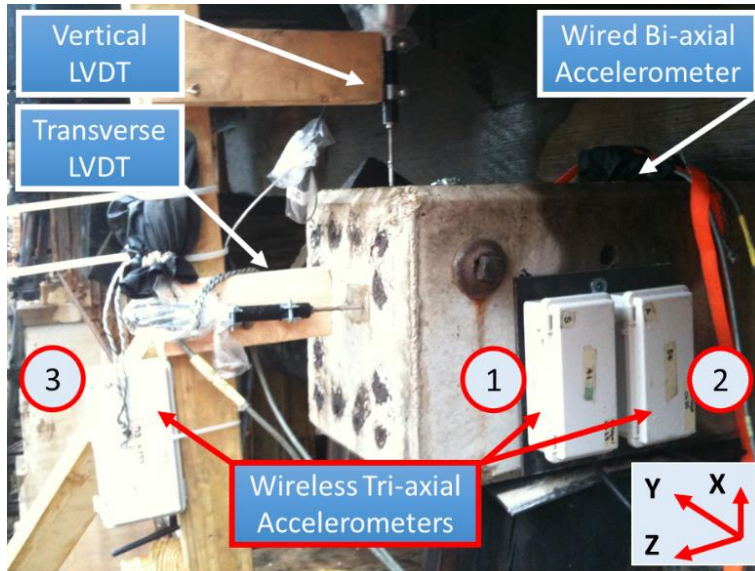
Pile cap instrumentation detail (showing LVDTs and accelerometers at pile cap).
